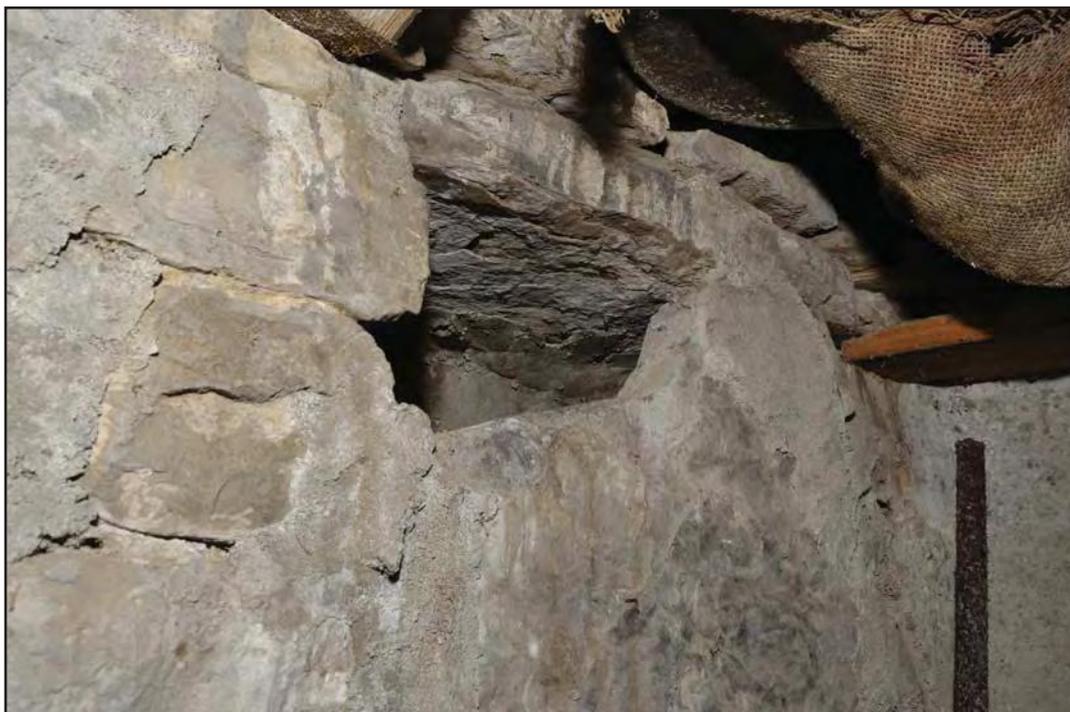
'Cubby hole' 3.3.002 without blocking stone, looking southwest.
